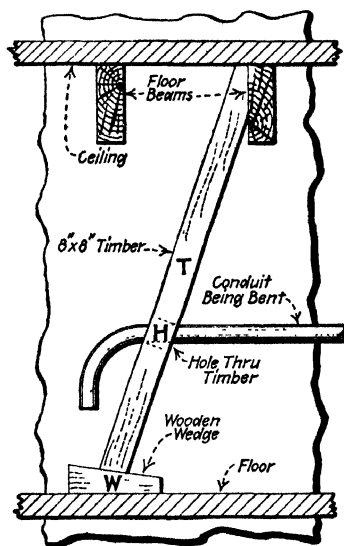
Timber braced between floor and ceiling for a bending rack.
